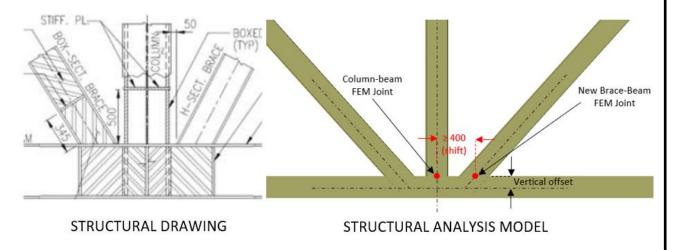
New joint due to structural shift ≥ 400 mm
